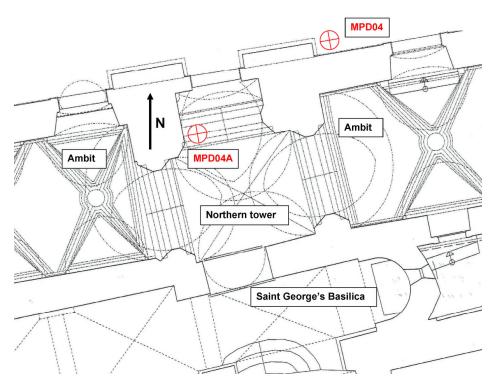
Site plan with instrumented boreholes in northern tower of the St. George's Basilica
